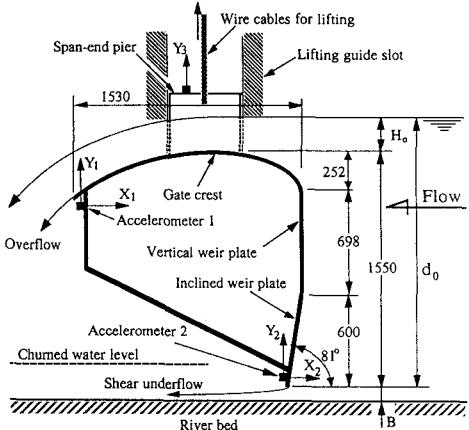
Cross-sectional view of the full-scale gate. (All linear dimensions in mm.)
